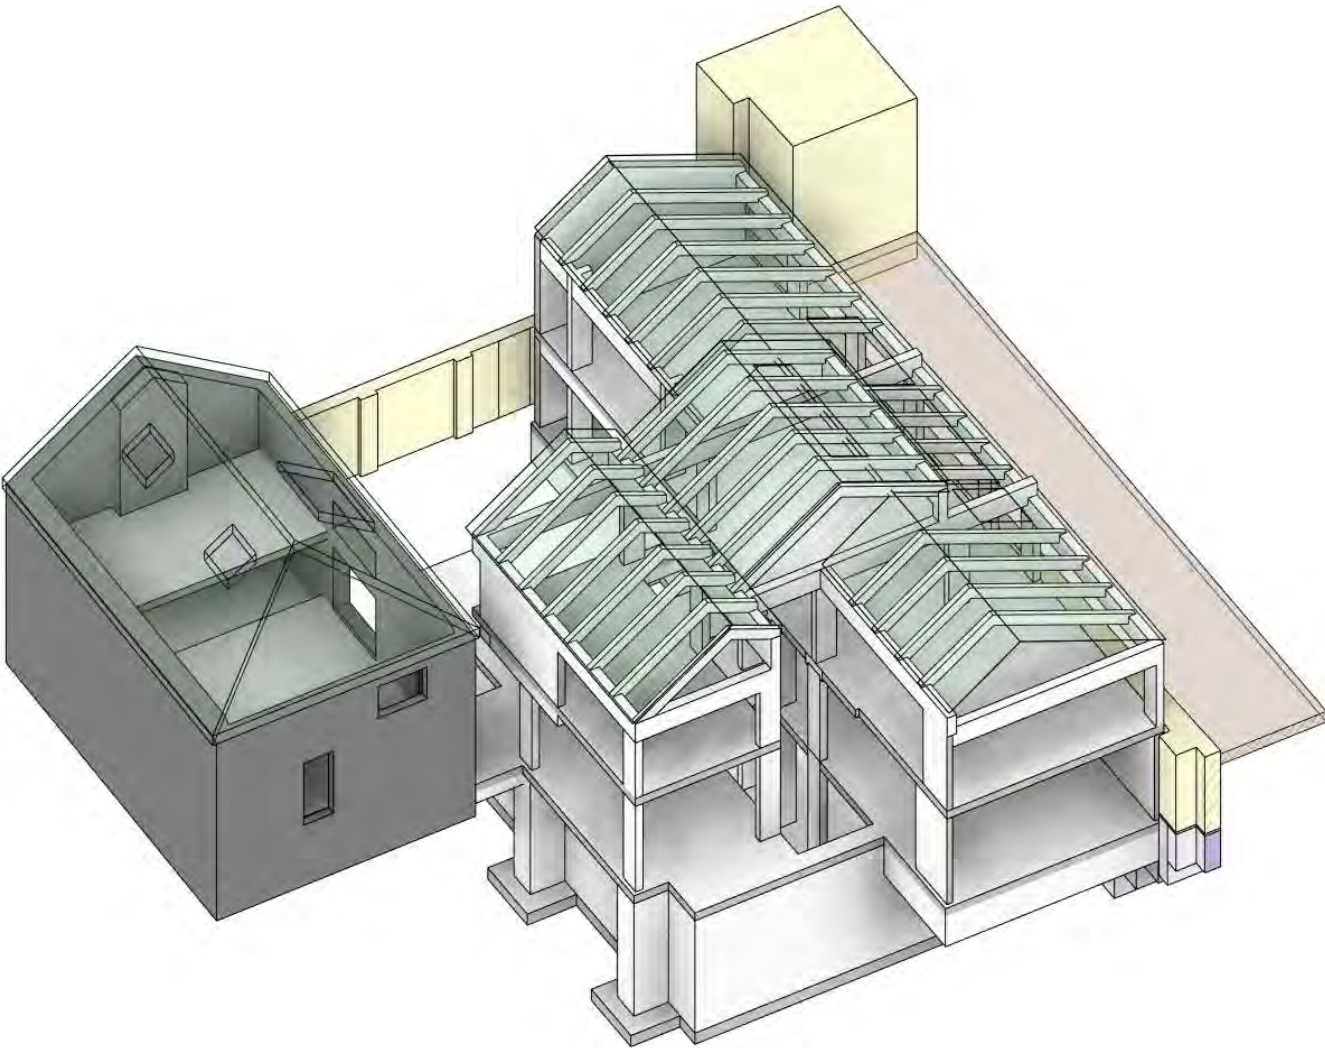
Isometric View Showing Proposed Structural Framing and Groundworks Basement Box Construction
